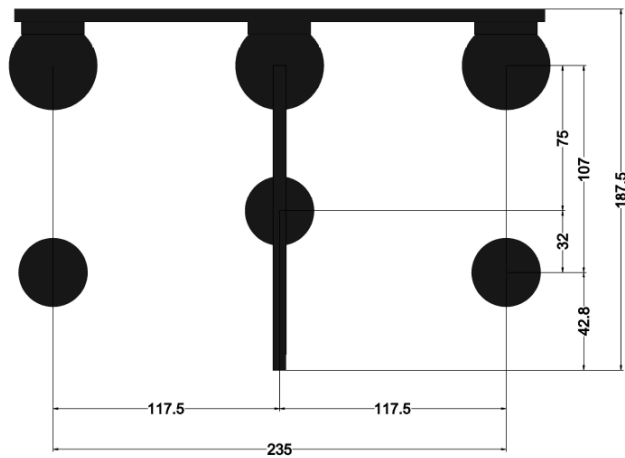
Extended 3 Numerical Model Cross-Section Dimensions. (All dimensions given in the figure are in millimeters.)
